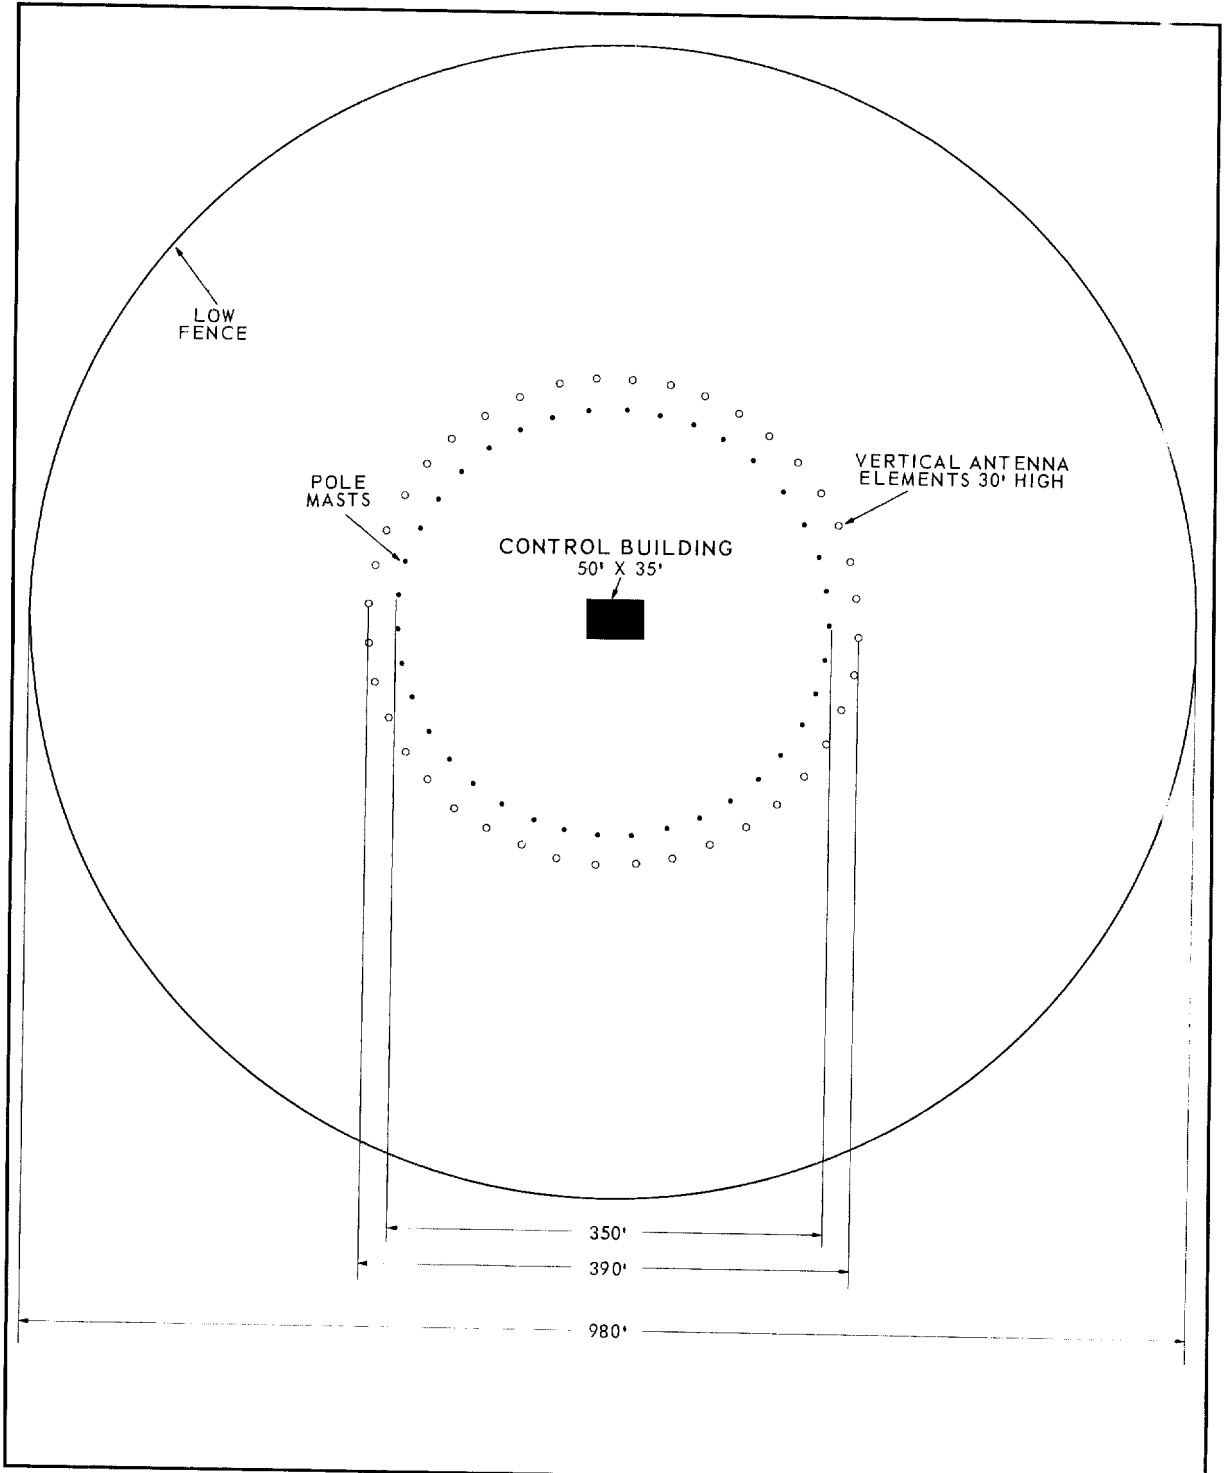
DIMENSIONAL DRAWING OF A TYPICAL KRUG INSTALLATION.
